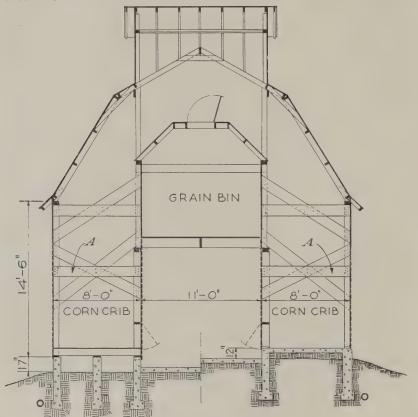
A combined crib and granary with either wood or concrete floor. Note system of bracing studs. Horizontal tie "A" consists of two 1- by 12-inch boards (one on each side of studs), bolted at each end with six \(^1\)4-inch bolts. All other parts of cross-brace and upper tie are 1- by 12- inch boards nailed at each end with 15 eightpenny nails. Braces are 4 feet apart.
